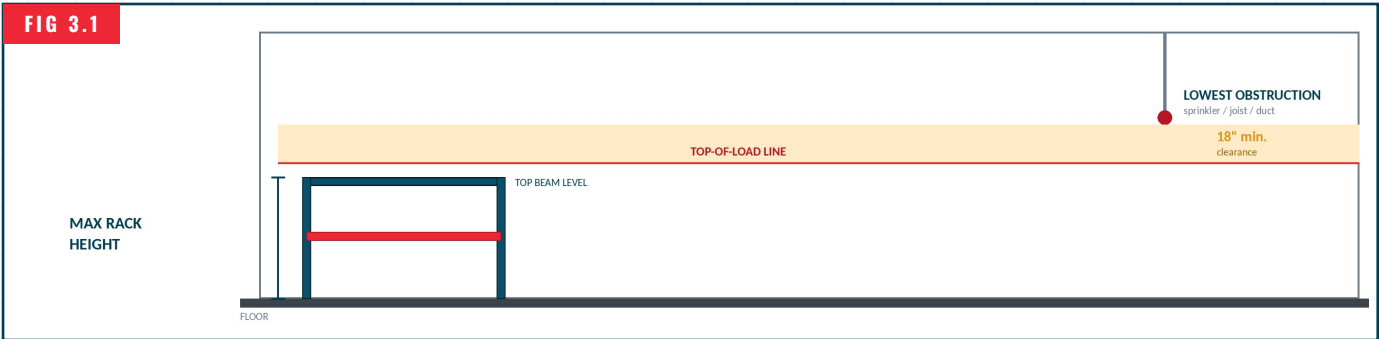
Cross-section diagram of a building bay showing how clear height is measured: floor to the lowest obstruction (sprinkler head / joist / duct), the 18-inch fire-code clearance above top-of-load, top beam level, and the resulting max rack height. Dimension arrows labeled. Turns an abstract rule into a picture buyers can measure against.
